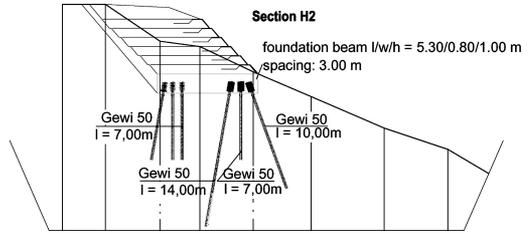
Oberstdorf: typical cross section of the retaining structure set on piles.
